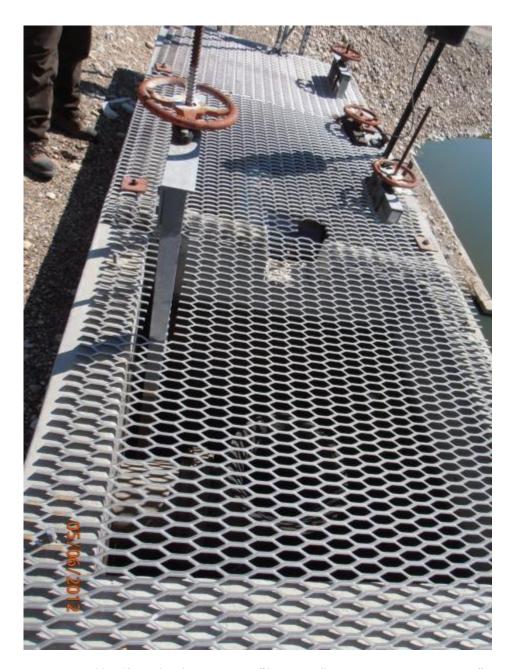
Pump Control Building and lift station head works at terminal end of Lagoon #3.
